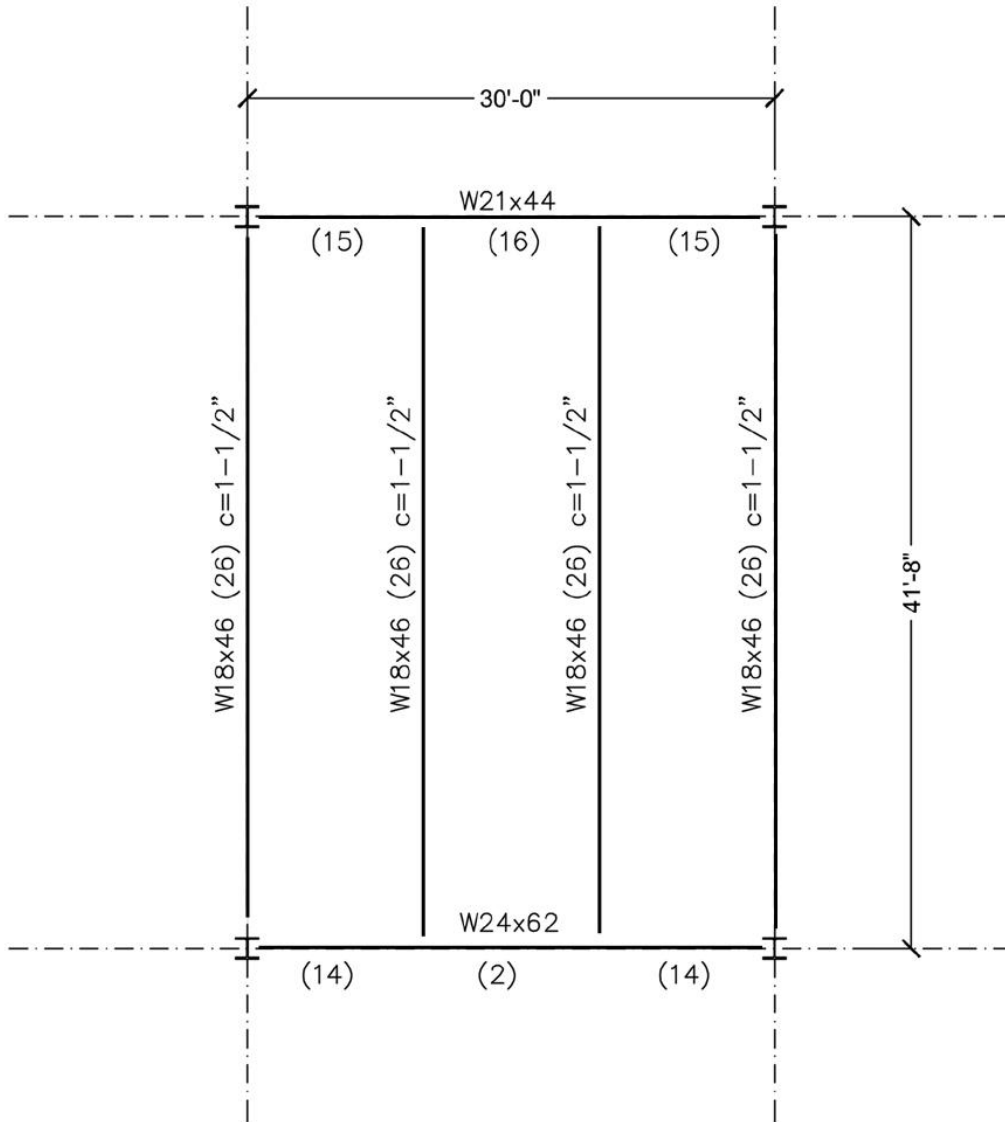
TYPICAL COMPOSITE LAYOUT
